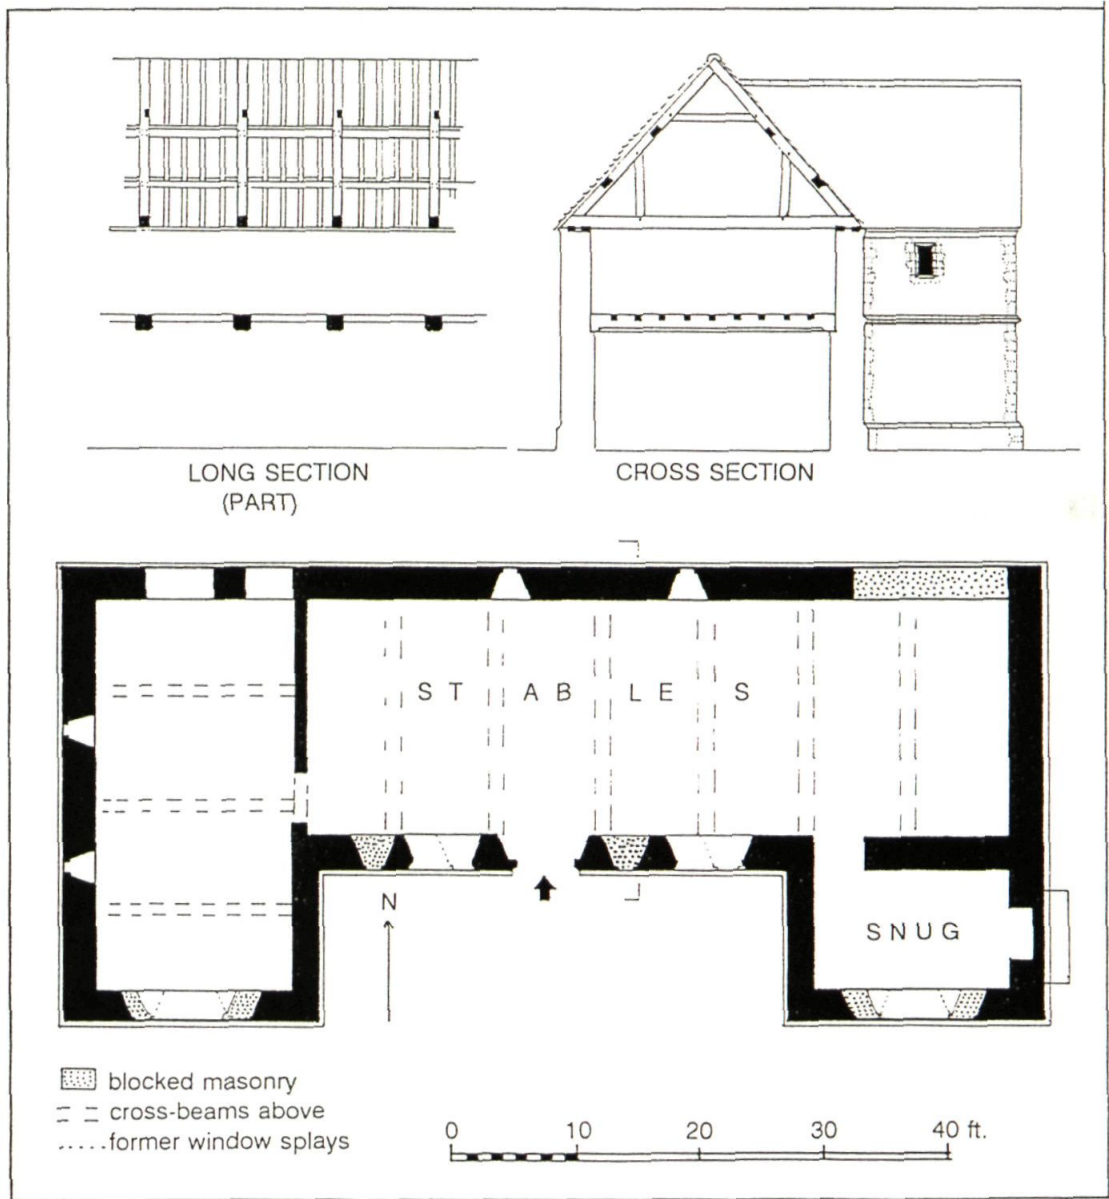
The stables at Chawton House; part long section, cross section and plan as they were before the conversion of 1981-82 (HRO Top 64/1/8).
